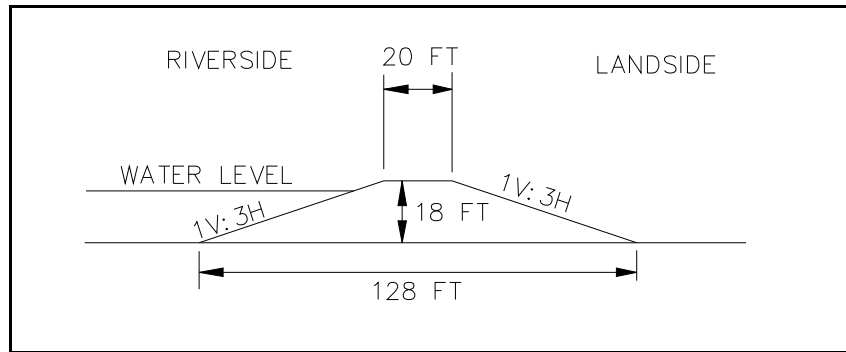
Typical levee cross section on Sacramento-San Joaquin River Delta.
